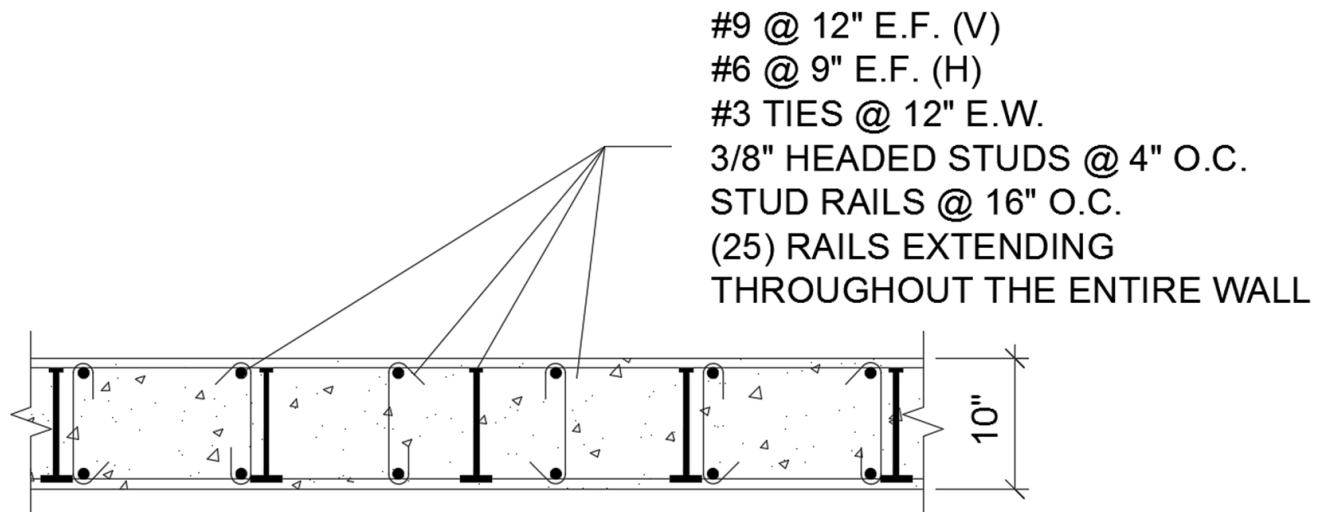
New exterior wall, cross-section at the 2nd floor level based on tsunami design requirements.
